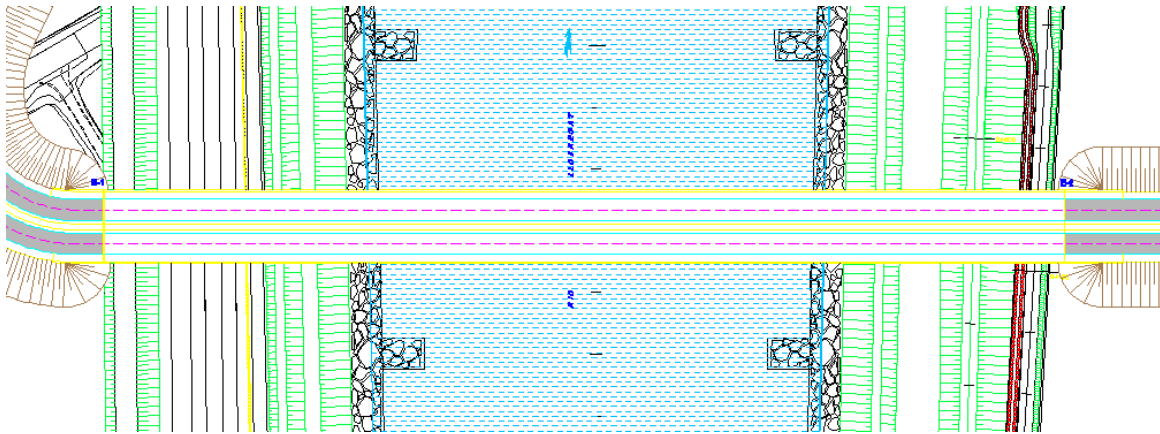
Plan view of the Llobregat River, with the plan alignment.
